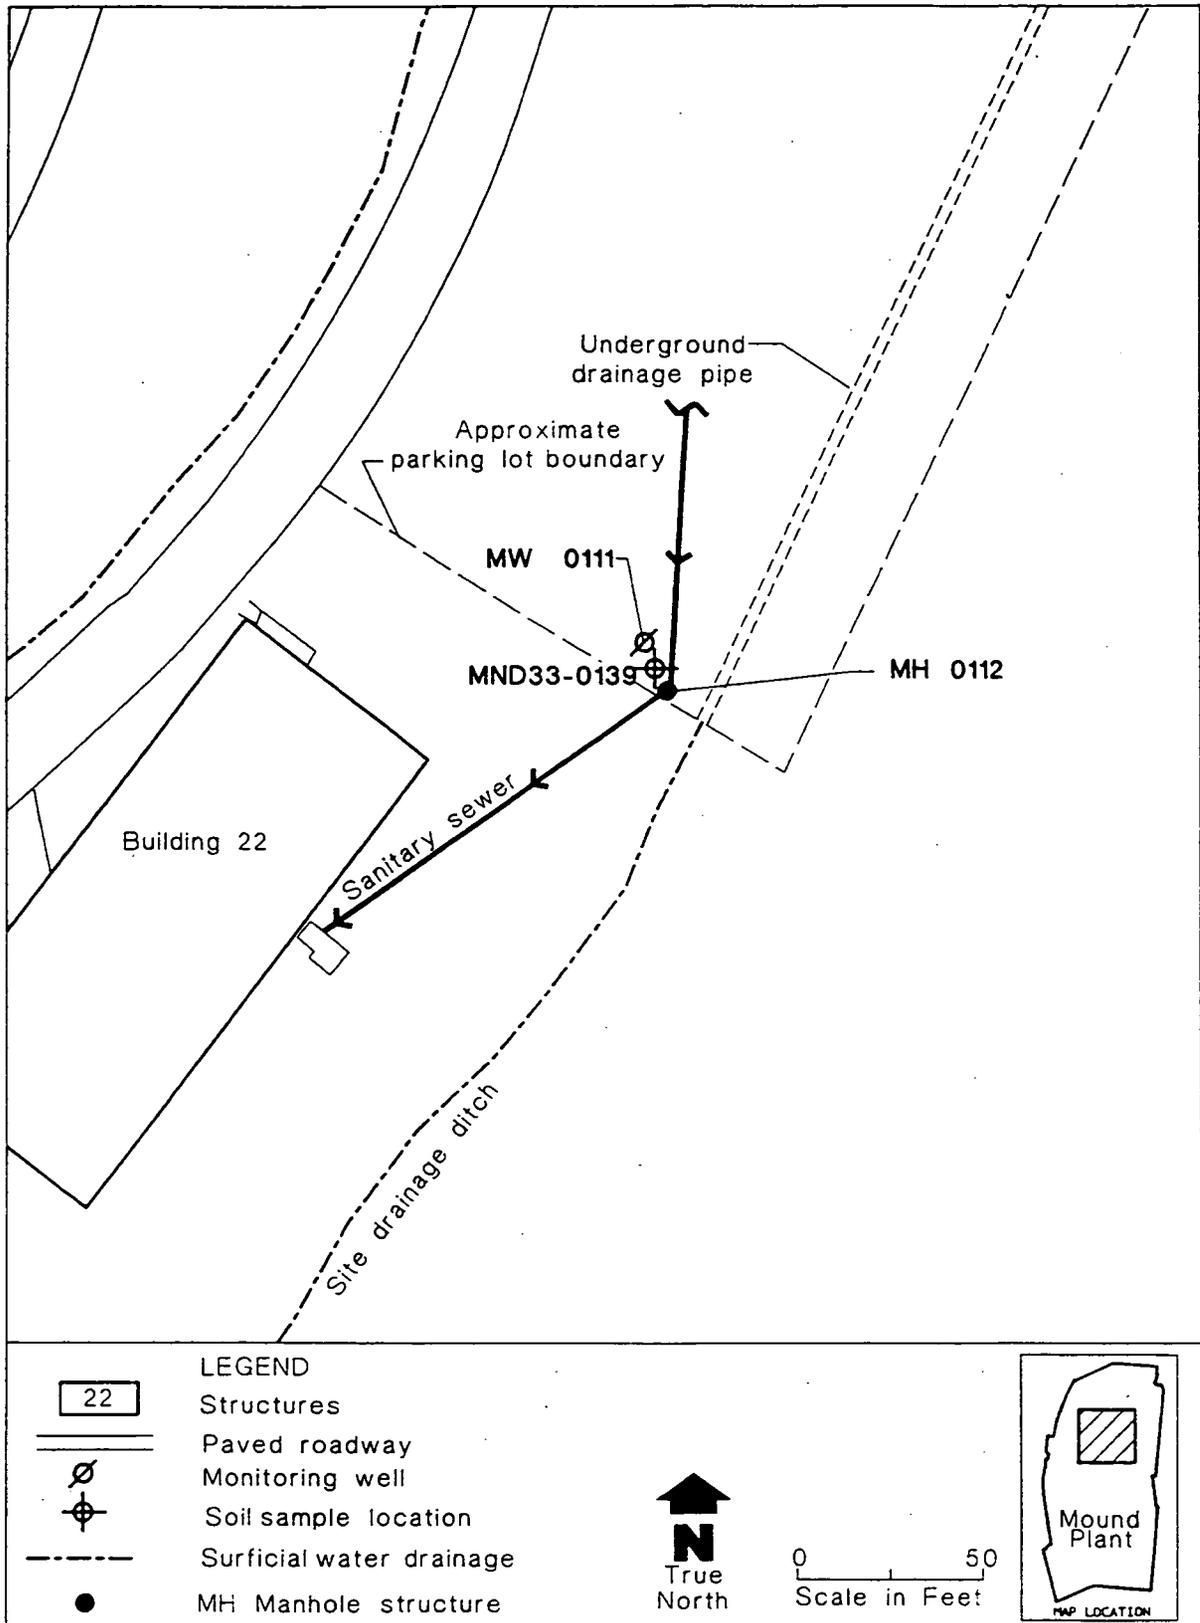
Underground sewer lines Grid G12 soil sample locations.
